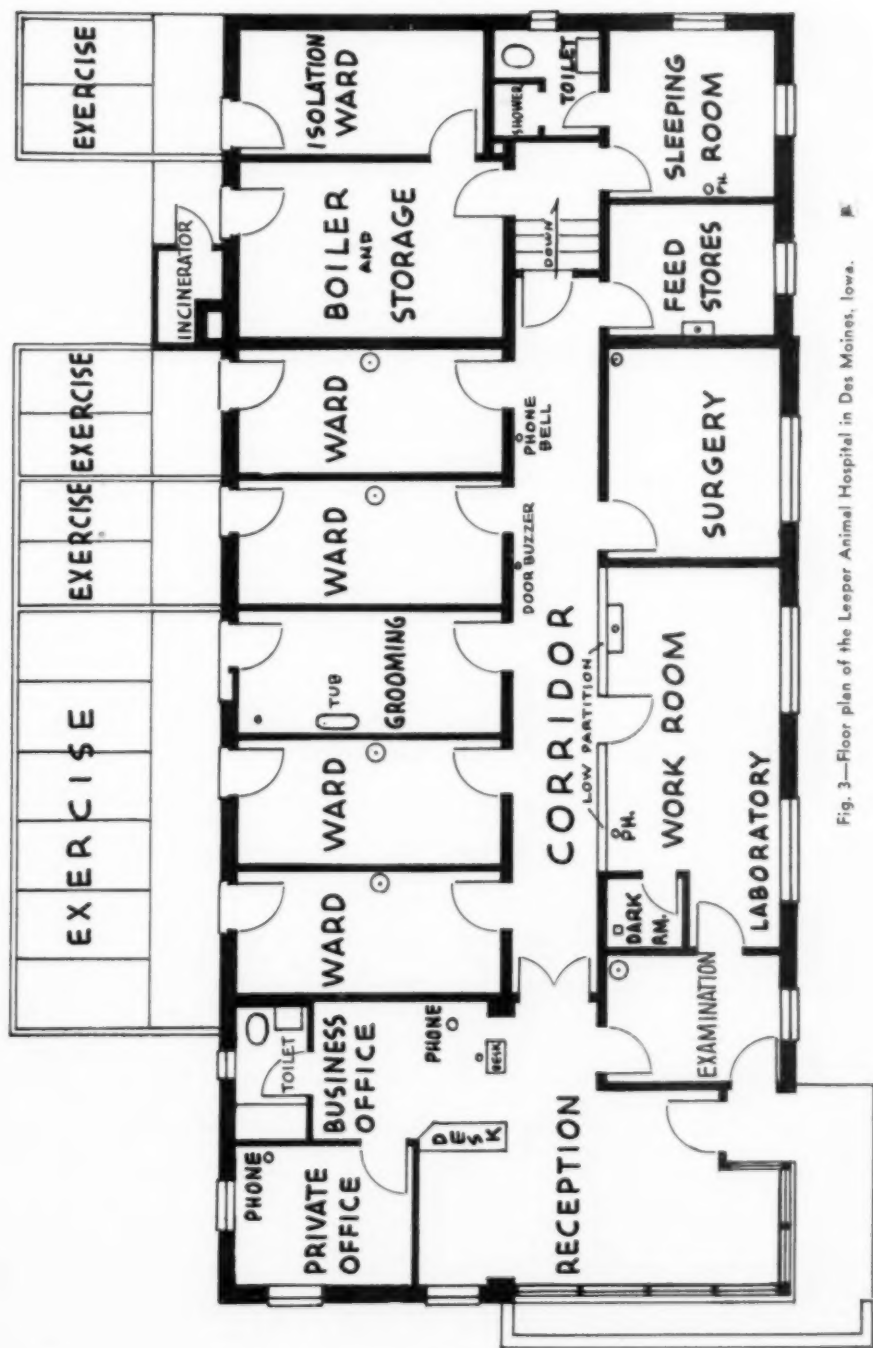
Floor plan of the Leeper Animal Hospital in Des Moines, Iowa.
